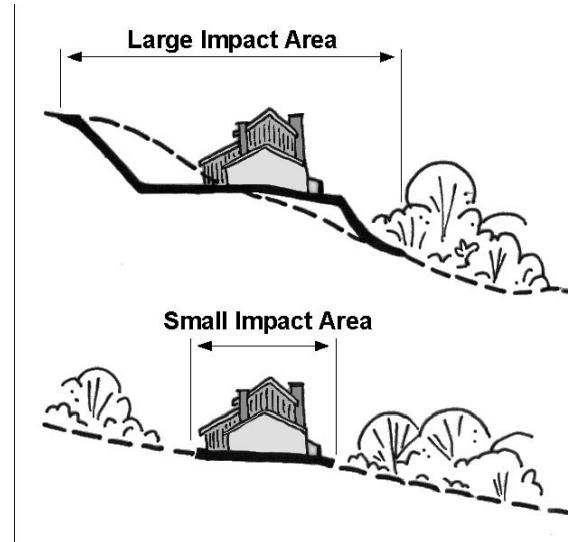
Flattening Steep Slopes for Building Sites Uses More Land Area than Building on Flatter Slopes
